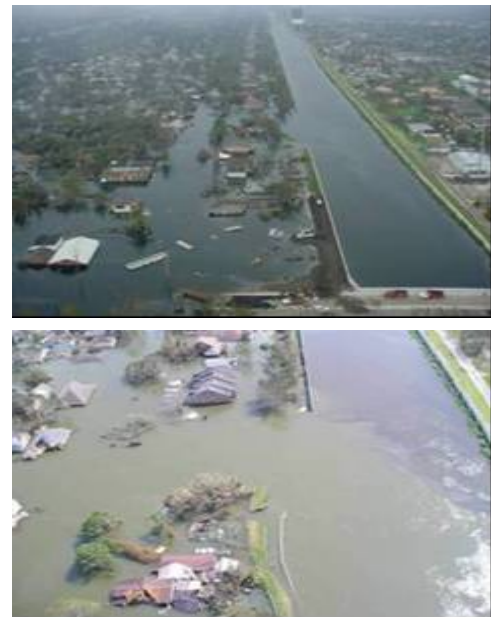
(a) aerial view of breach, (b) aerial view showing I-wall and embankment translation.
